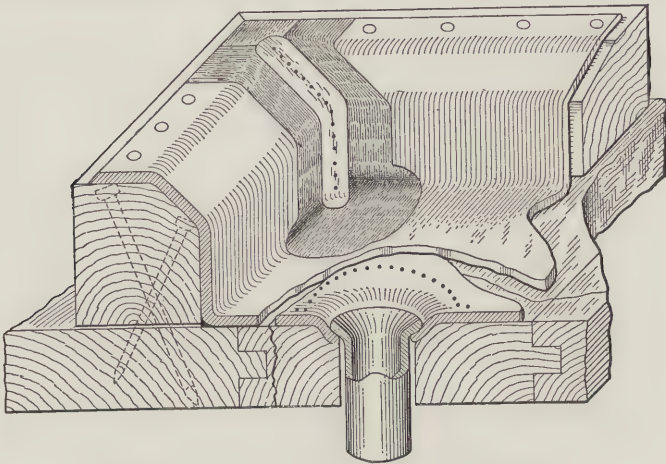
LEAD TANK SAFE PAN LAID ON FLOOR
